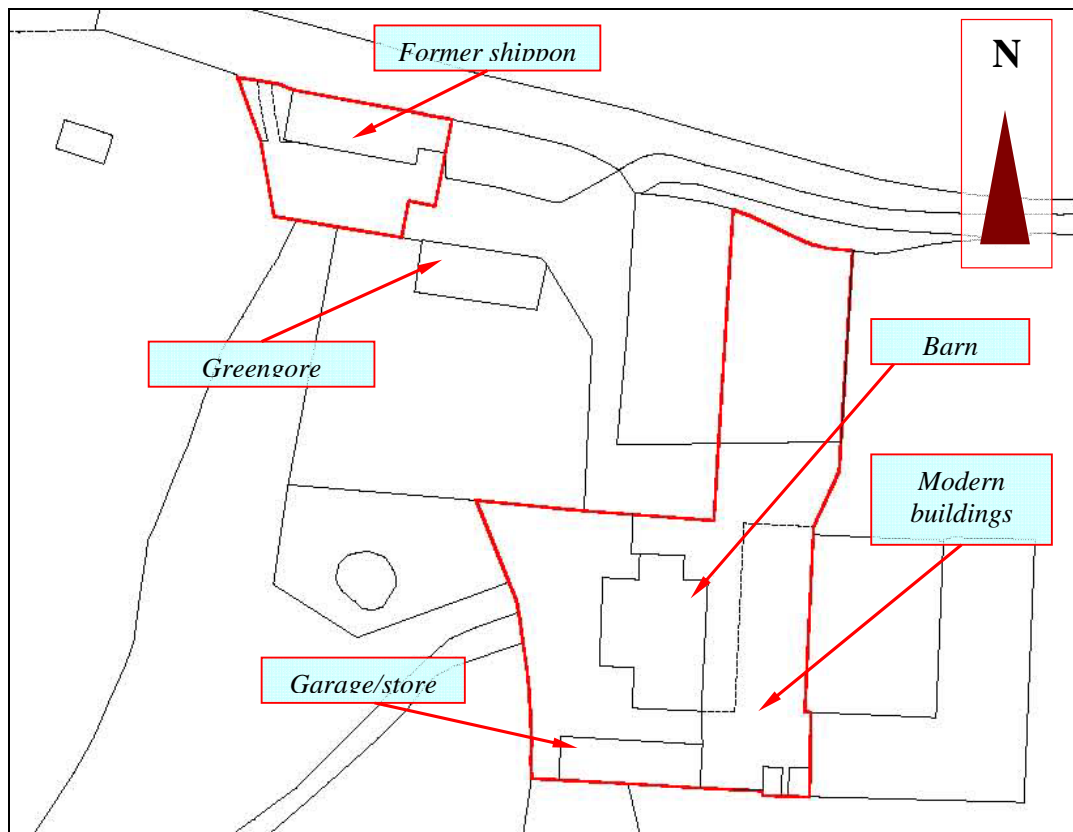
Elements of the site (plan by Anderton Gables Chartered Building Surveyors)
